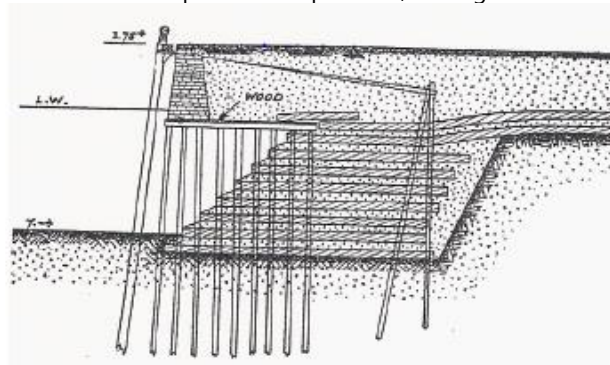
Cross section of a quay wall in Rotterdam, 1930, Source: de Gijt (2010)
